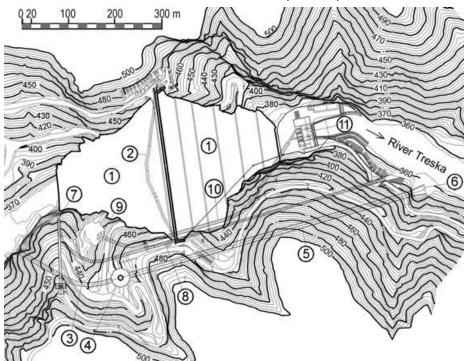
Layout of the hydraulic scheme with Kozjak Dam. (1) Dam body; (2) grouting gallery; (3) diversion tunnel; (4) morning glory (shaft) spillway; (5) spillway tunnel; (6) flip bucket; (7) intake structure of the bottom outlet; (8) bottom outlet tunnel; (9) intake structure of the power plant; (10) water supply tunnel for the power plant; (11) tail raise channel
